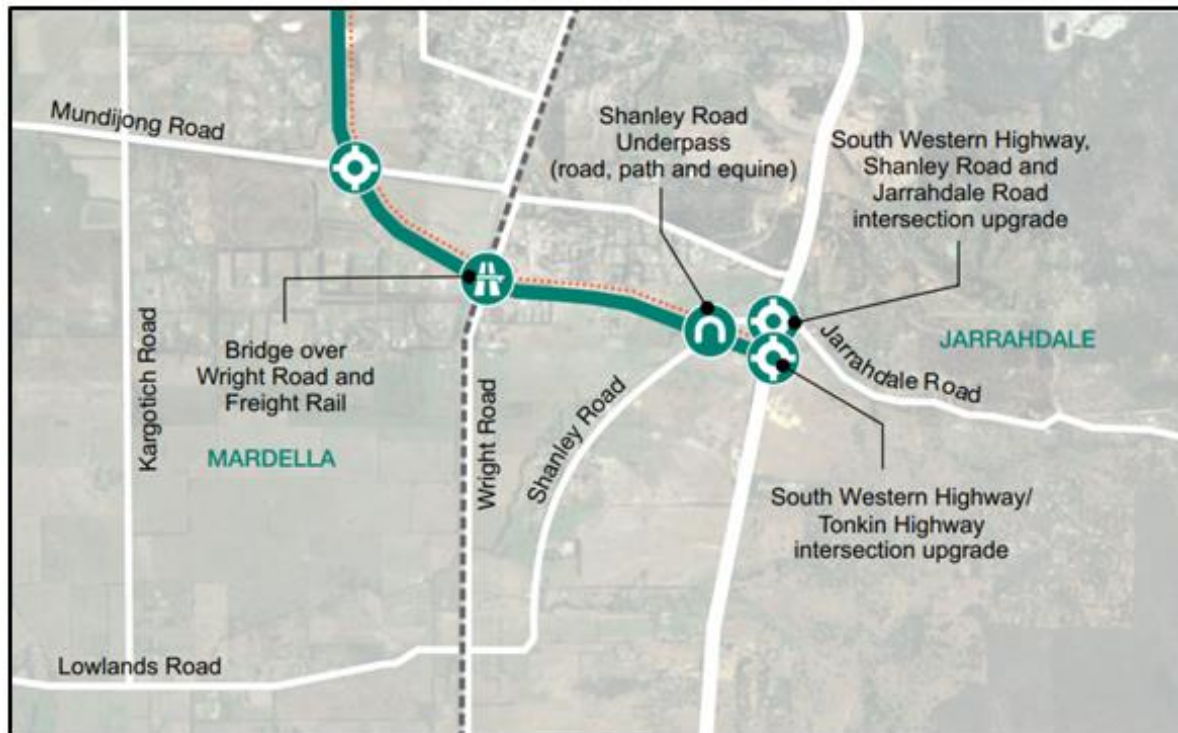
Main Roads WA Tonkin Highway Extension Indicative Plan
